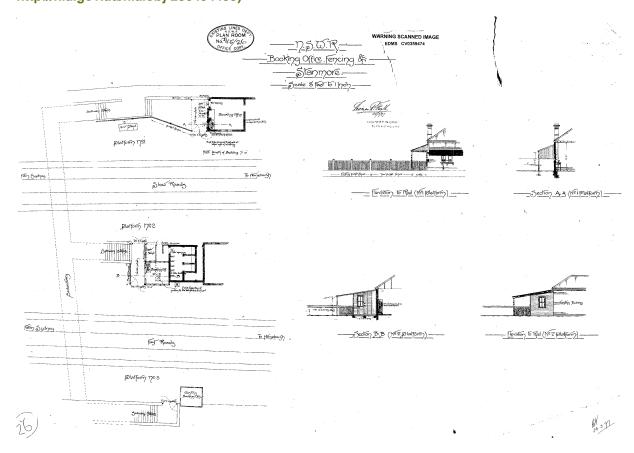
An 1897 plan of Stanmore Station showing the 1885 subway alignment and alterations to the platform buildings (Source: Sydney Trains Archives, 0359474 AOC)
